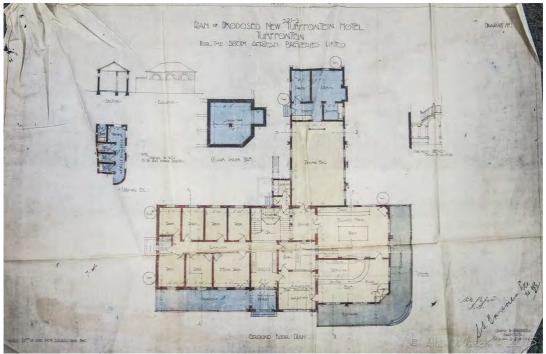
Floor plan for proposed Turffontein Hotel from 1905 (Source: City Council of Johannesburg, Plans Archive)
